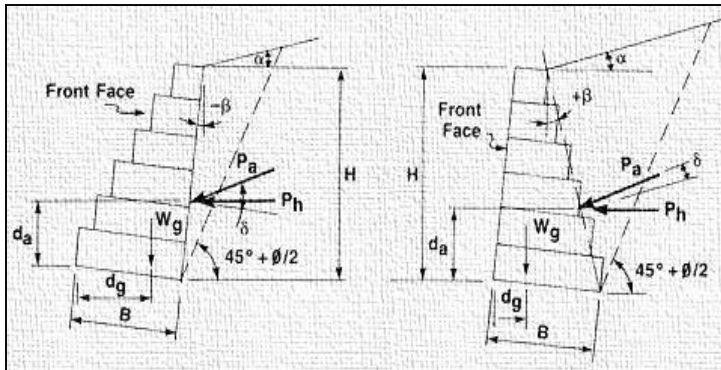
Construction of the gravity wall: a- stepped front face; b- stepped back face [10]
